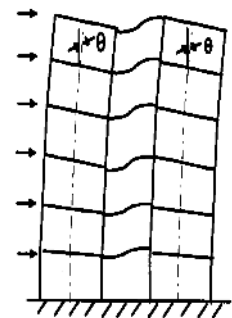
Deflected shape of a typical shear wall - slab structure subjected to lateral loads
